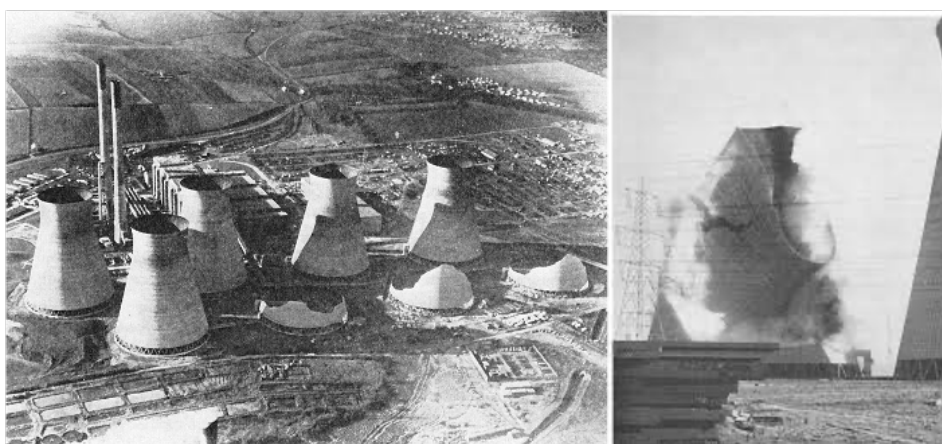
Collapse of three cooling towers in Ferrybridge, 1965.
